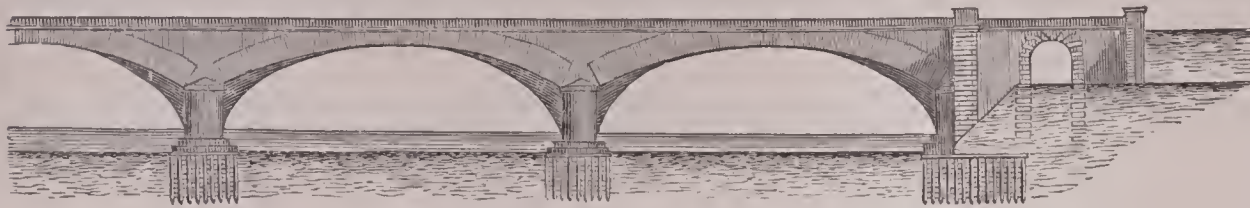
Perronet's bridge at Neuilly, 1774.
